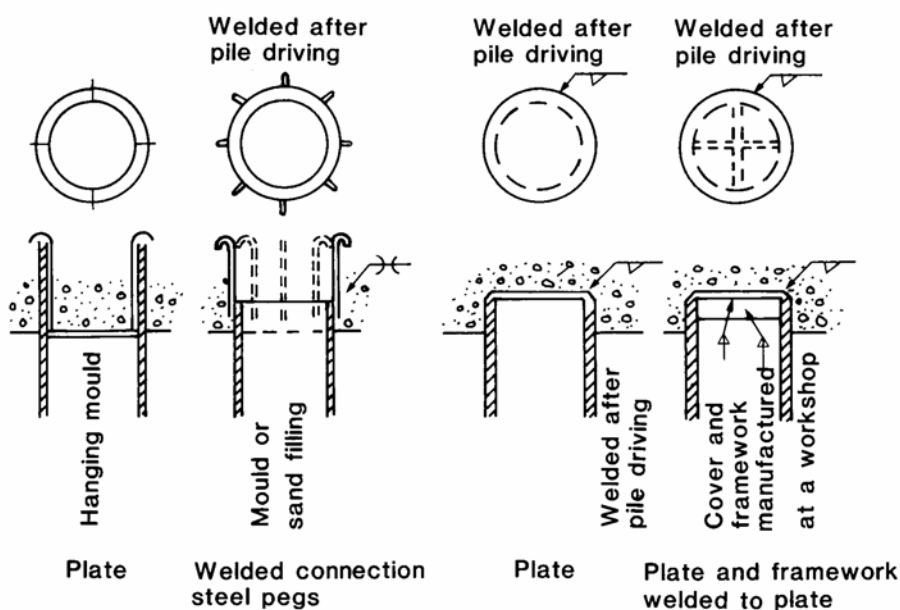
Typical joints between an open-ended steel pipe pile and concrete footing.
